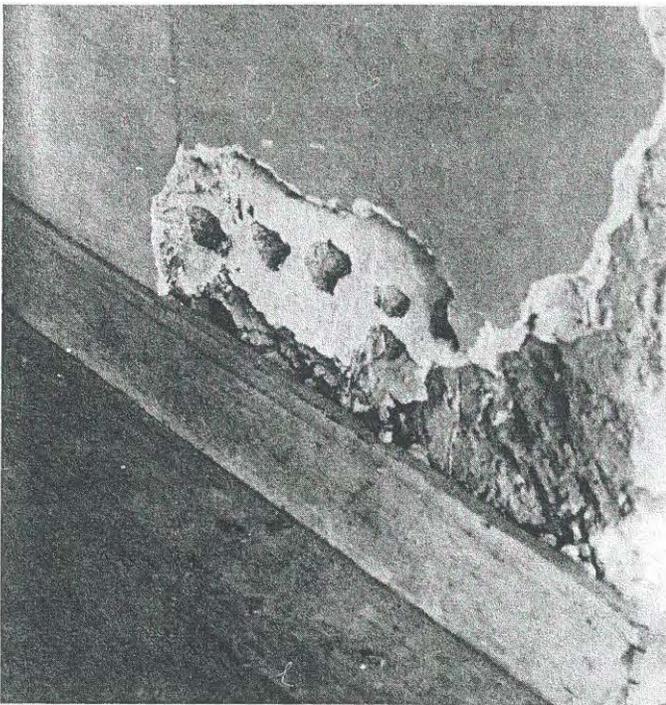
The builders of this mid-18th century house installed the baseboard moulding first, then applied a mud and horse hair plaster (called *paling*) to the masonry wall. Lime was used for the finish plaster. Also shown are the hacking marks which prepared the wall for a subsequent layer of plaster. Photo: Kay Weeks.
